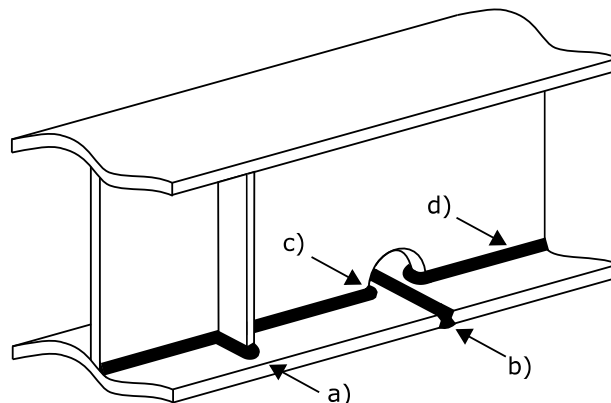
Typical weldments in bridges. a) non-load-carrying transverse attachment, b) butt weld, c) cope-hole and d) longitudinal flange-to-web weld.
